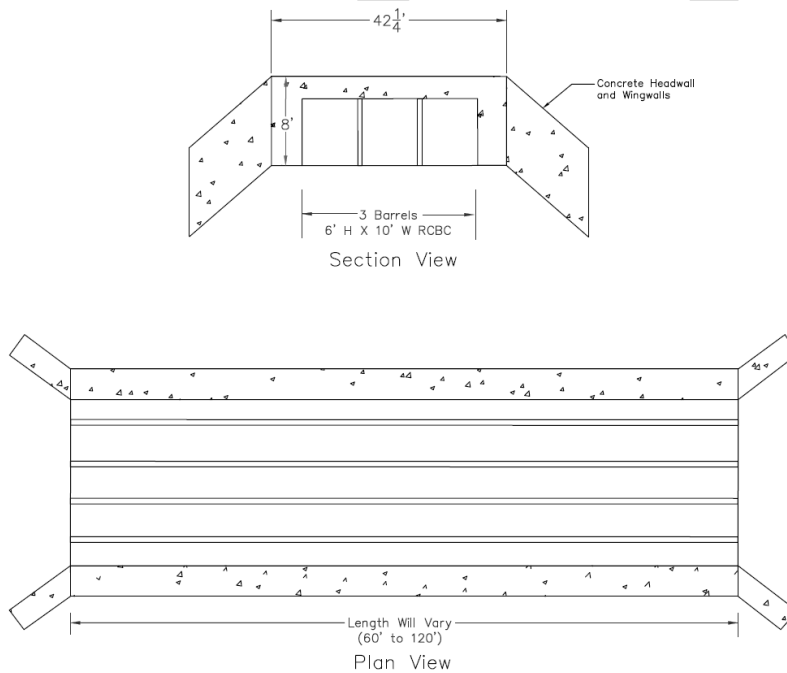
Typical Canal Road Crossing Structure – 500 cfs Canal
